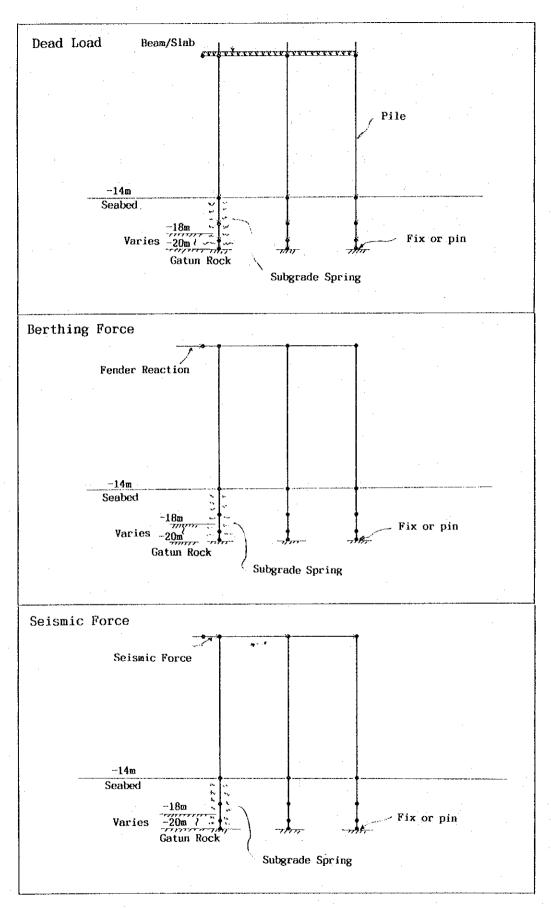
(d) Basic Loading Case: Pier No. 16
